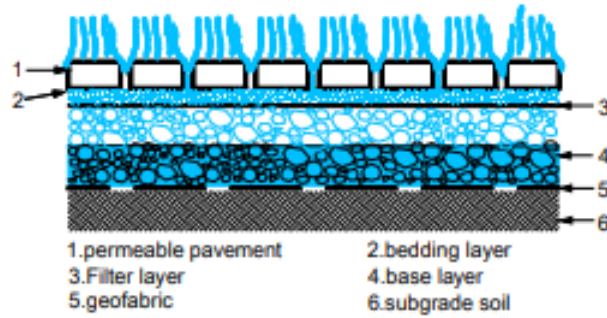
Rainwater falling on a permeable pavement is infiltrated to the base, which serves as a reservoir to store water
